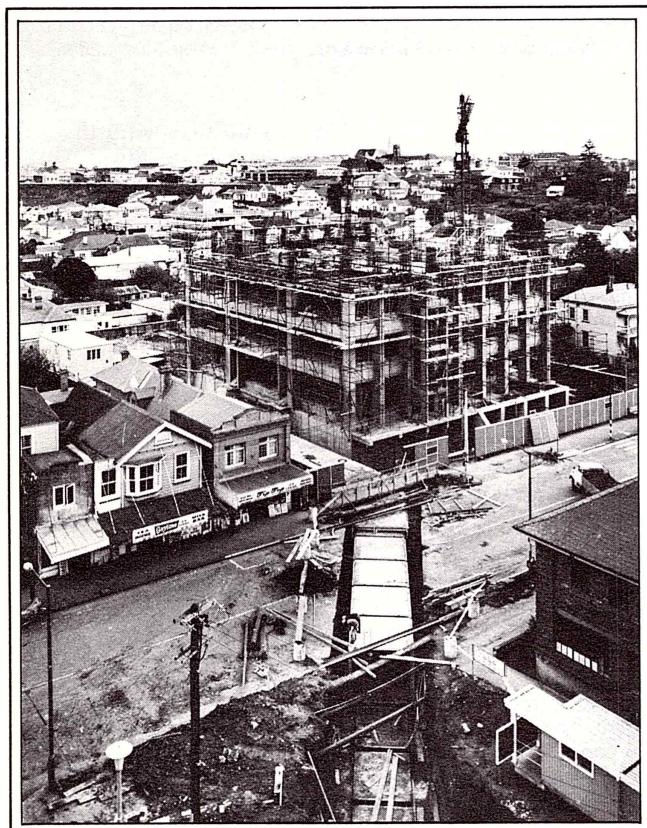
The tunnel under Park Road in the course of construction. It was made of prefabricated inverted U sections. The excavation and laying of the tunnel was carefully planned to interrupt traffic for a very short time. The tunnel provides a pedestrian link for students and staff between the School of Medicine and the Auckland Hospital. It also carries a steam line to the School of Medicine from the boiler house on the Auckland Hospital site. Telephone and computer cables are also housed in the tunnel. The system links with a tunnel running parallel to Park Road, giving the nurses access to their various homes, including the new one on the corner of Park Road and Grafton Road.
